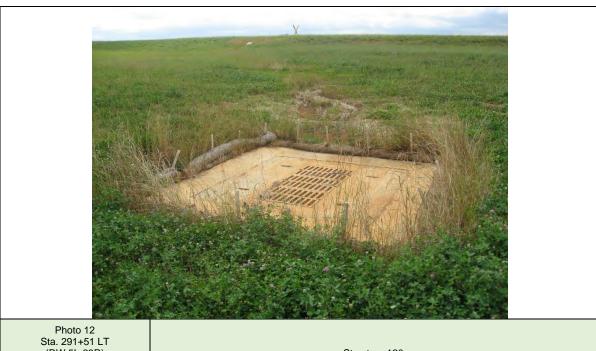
Sta. 291+51 LT (RW 5L-23R) Structure 120 Project 3
